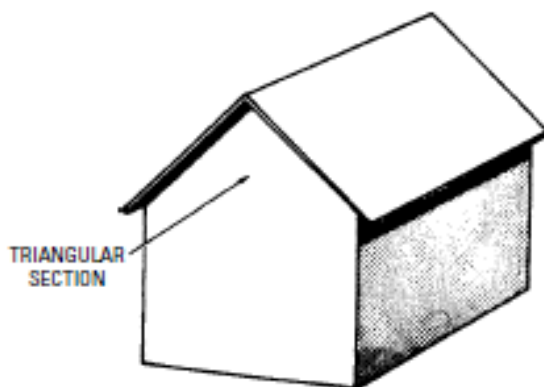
Gable or pitch roof that can be used on all buildings.
